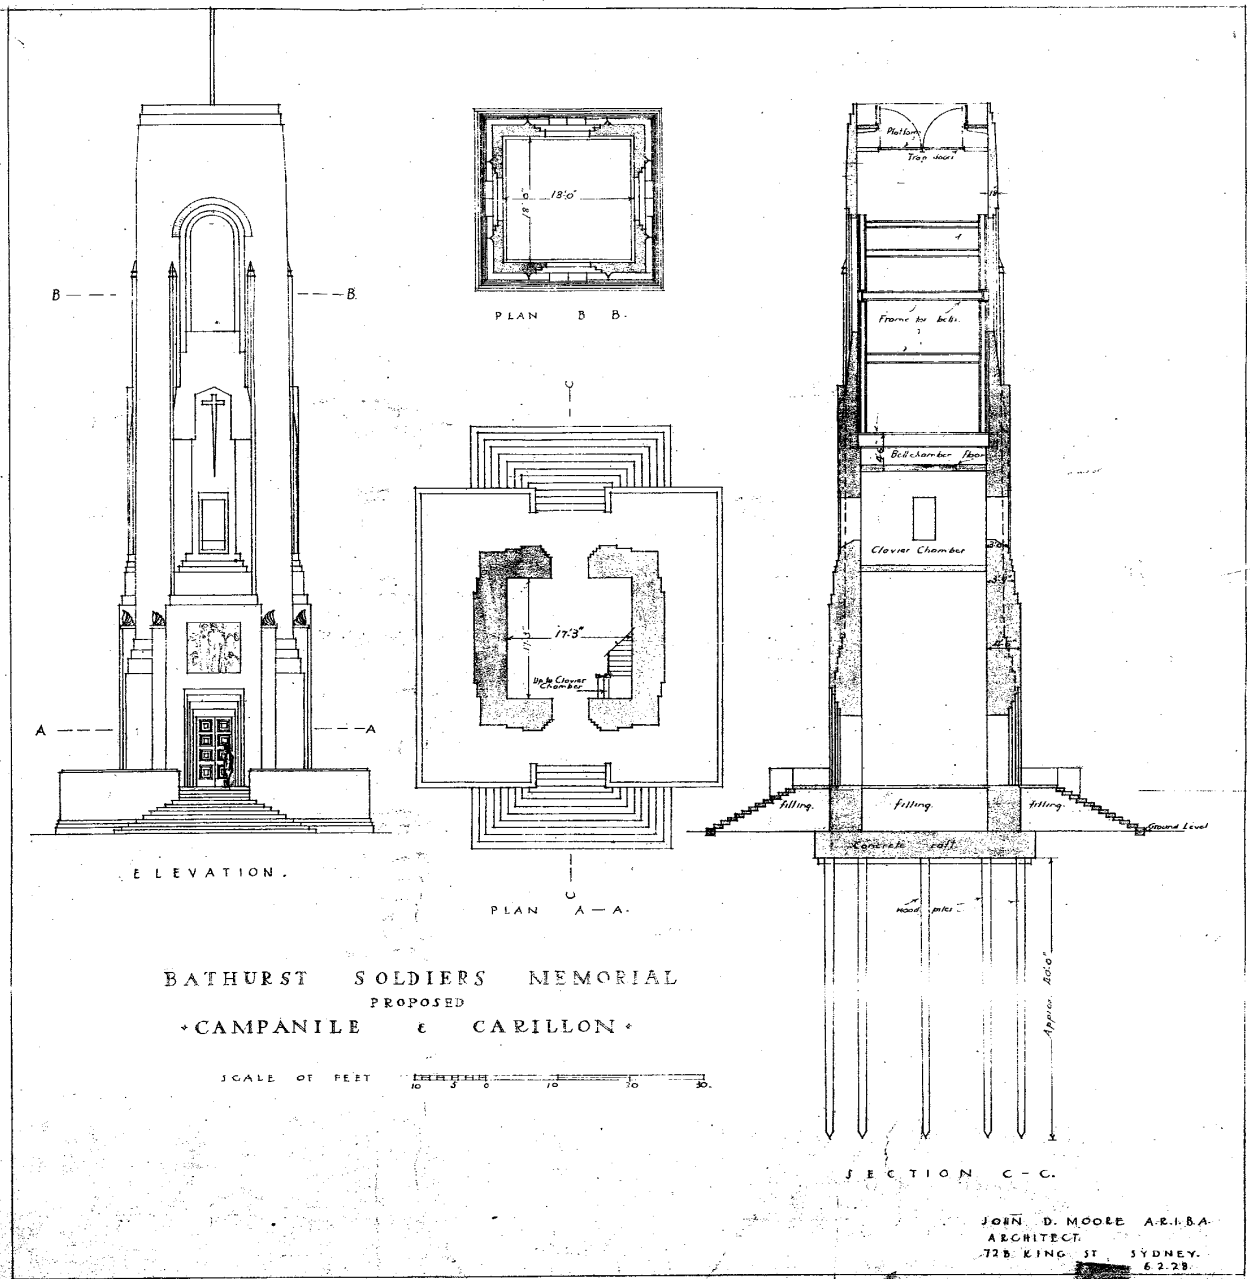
The Architect John D. Moore's Sketch plan of 1928
